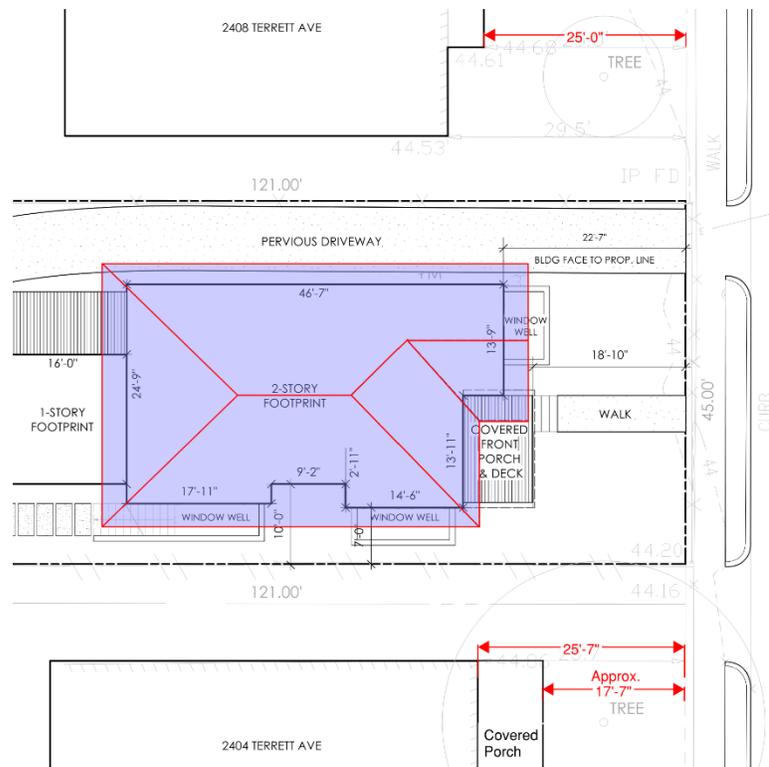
Proposed “L-shape” Building Layout and Alignment with North and South Neighboring Structures
